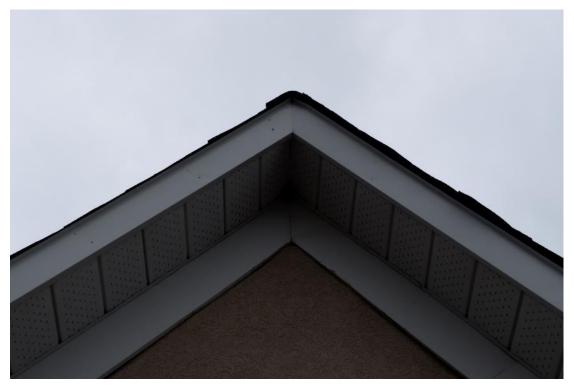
Typical example of modern aluminum facia, soffit and frieze.
